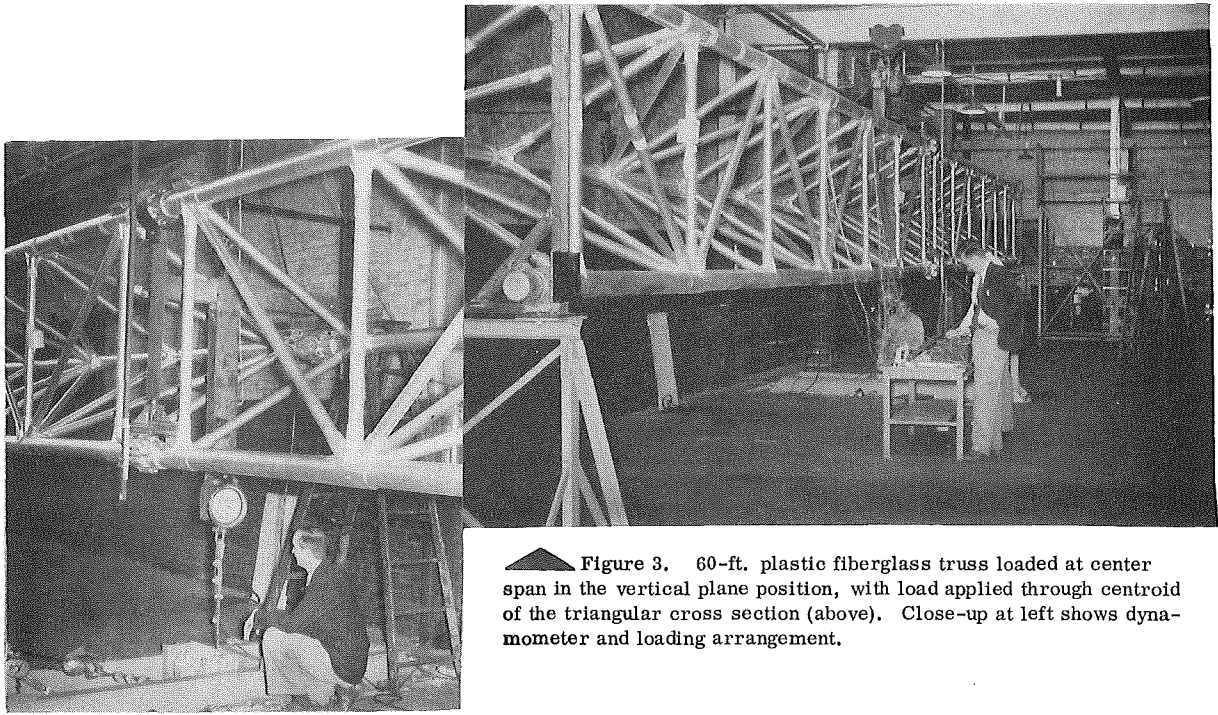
60-ft. plastic fiberglass truss loaded at center span in the vertical plane position, with load applied through centroid of the triangular cross section (above). Close-up at left shows dynamometer and loading arrangement.
